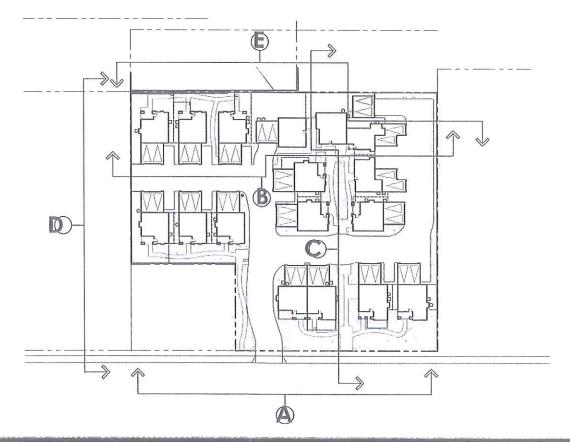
B - Street Elevations Planned USE DEVELOPMENT AT CITY OF DURATE
